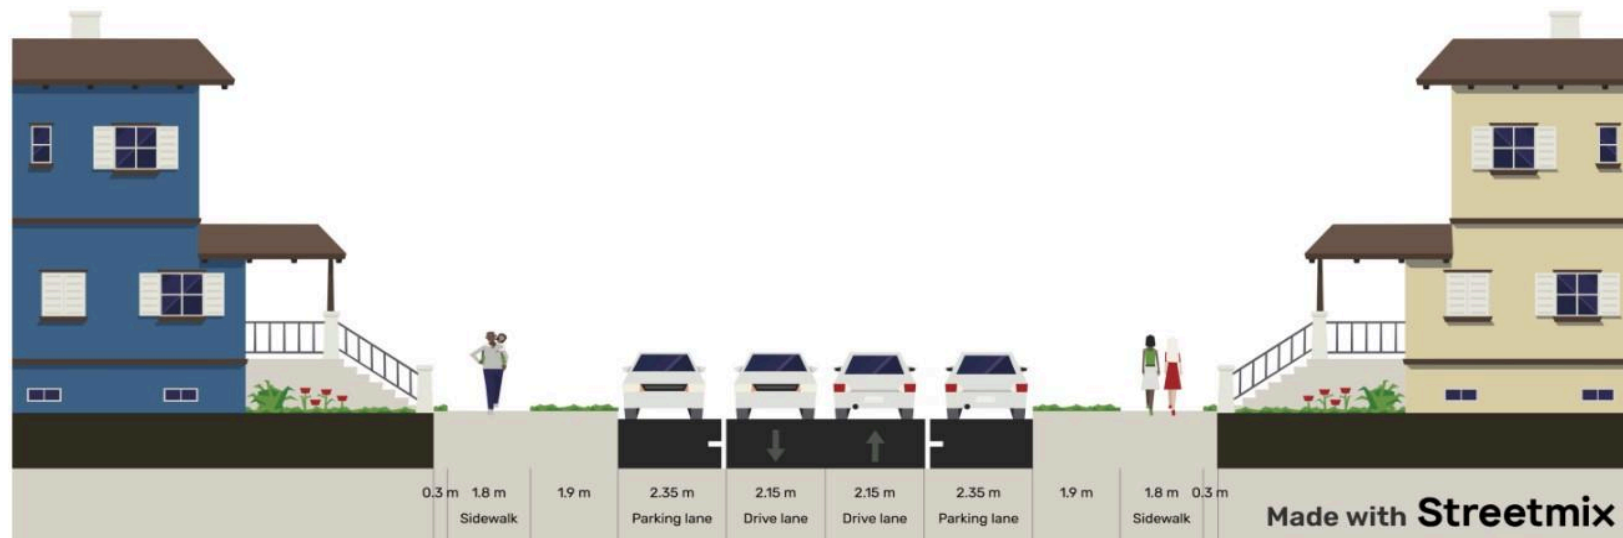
Local Road Option 3 - 18m ROW, 9m Road with 1.8m Boulevard walks
